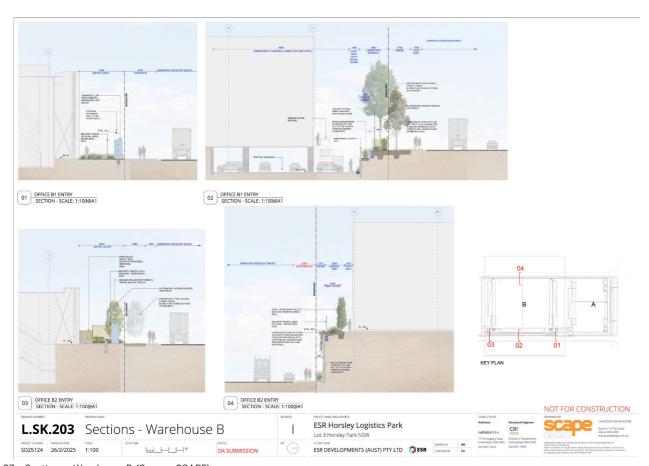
Sections - Warehouse B (Source: SCAPE)
